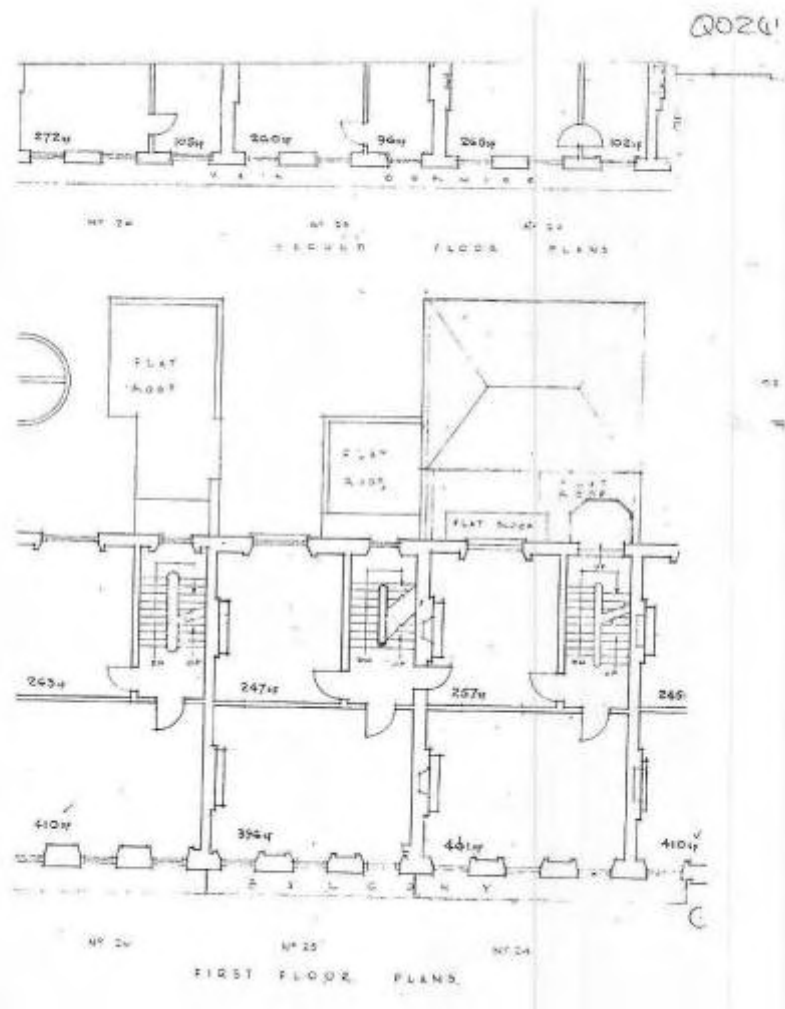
Extract of Ministry of Works plans 1946, First Floor plan for Chester Terrace Nos. 26 – 24. Crown Estate Archive.
